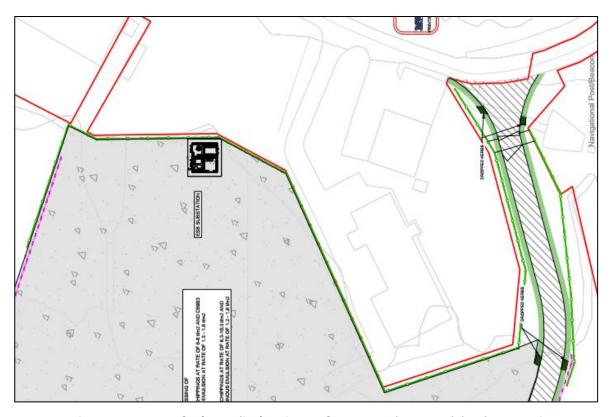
Layout for (green line) perimeter fence around proposed development site.
